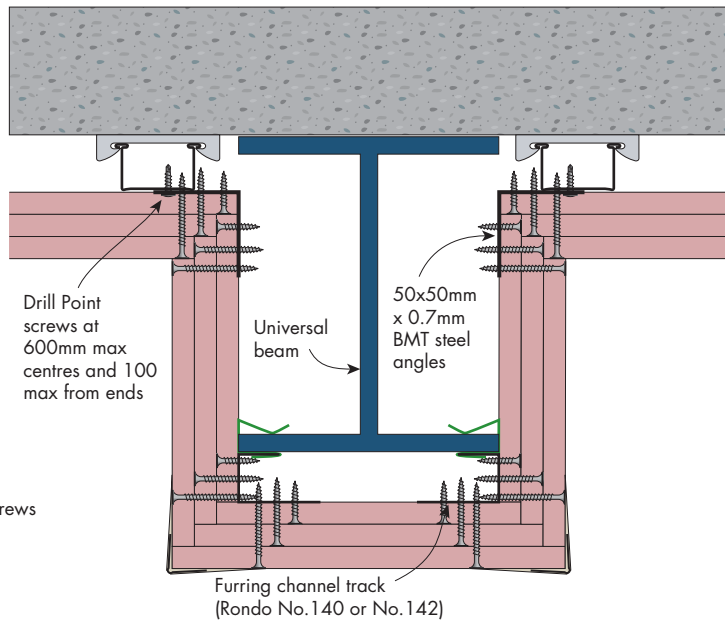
3 Sided Protection for I-Beam to Ceiling
